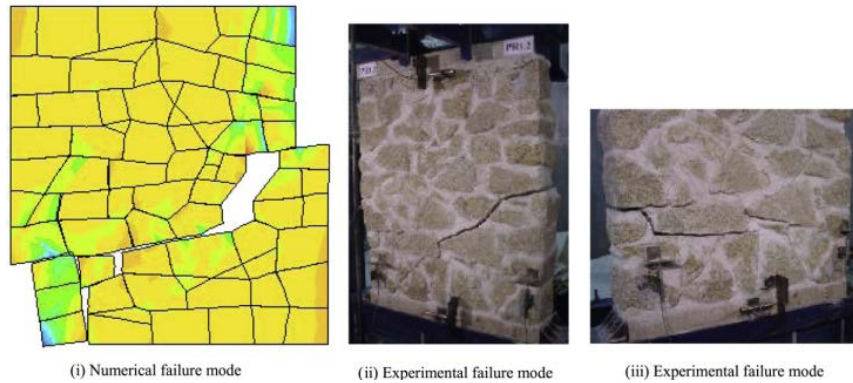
Stone masonry wall used by Senthivel and Lourenco (2009) in the laboratory and numerical model
